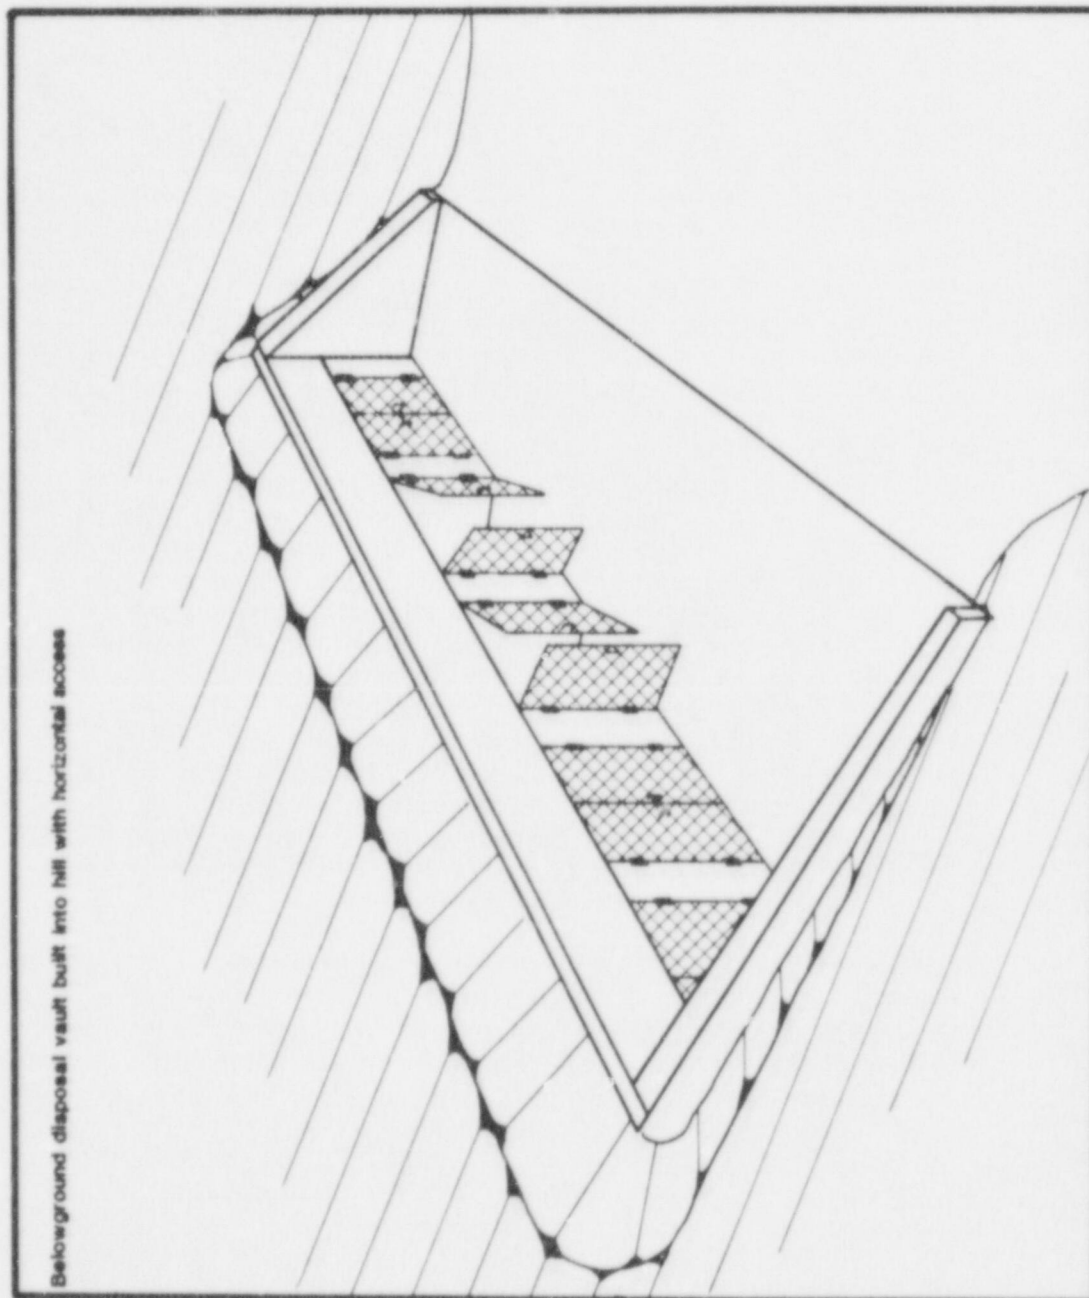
Compartmentalized belowground LLW disposal vault units constructed inside of hill with access through door openings in walls
